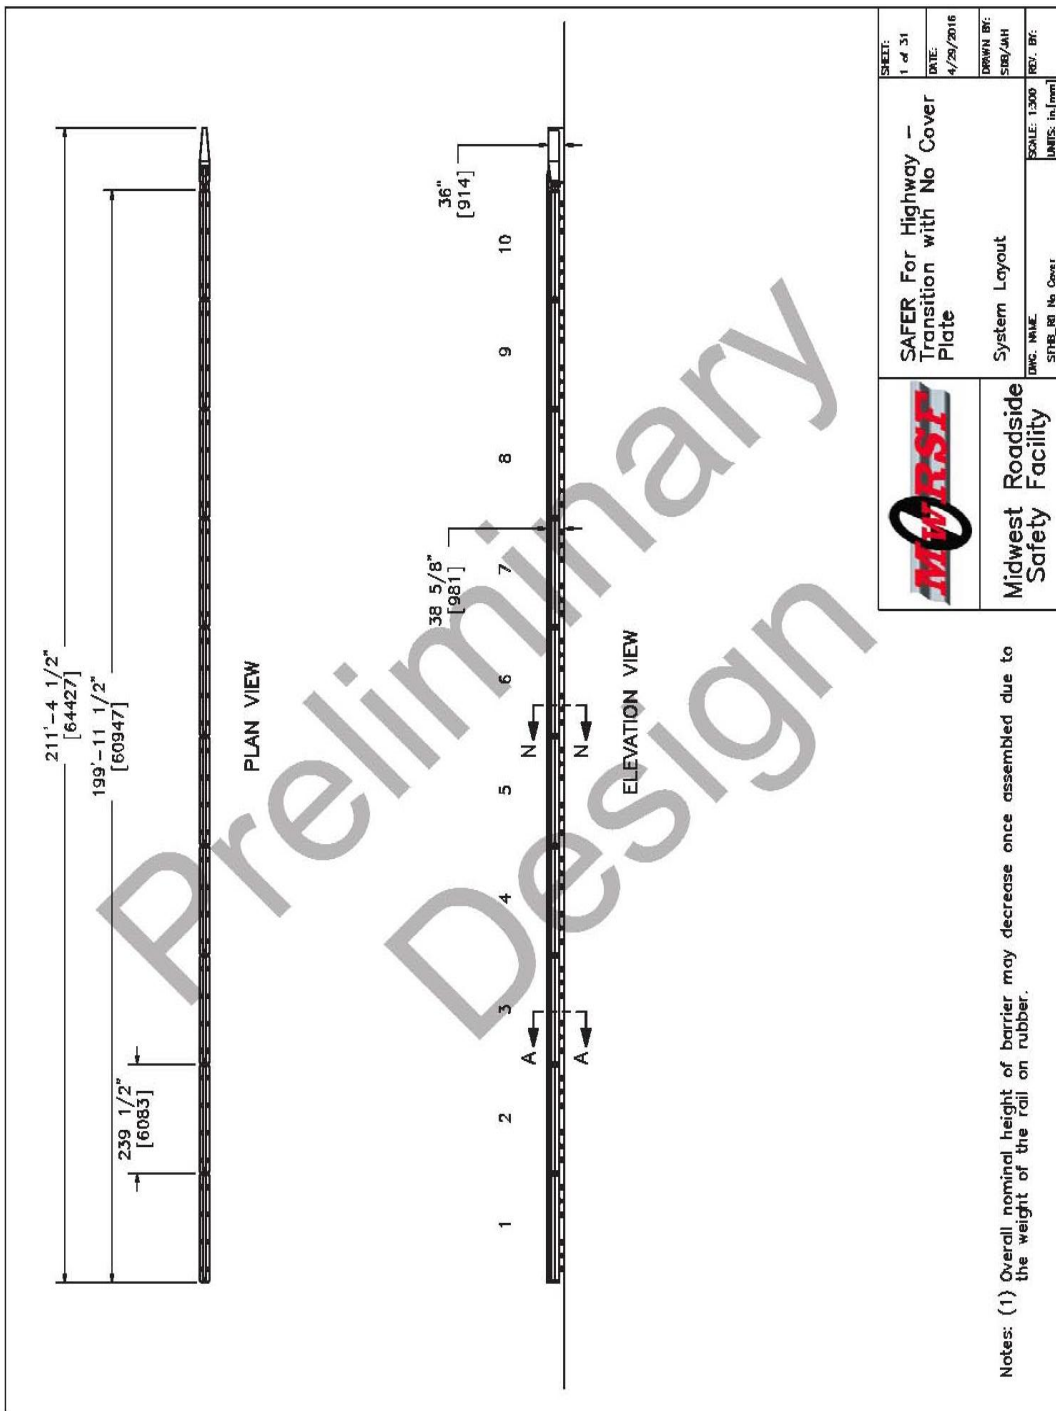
System Layout, No Cover Plate, RESTORE Barrier Transition
